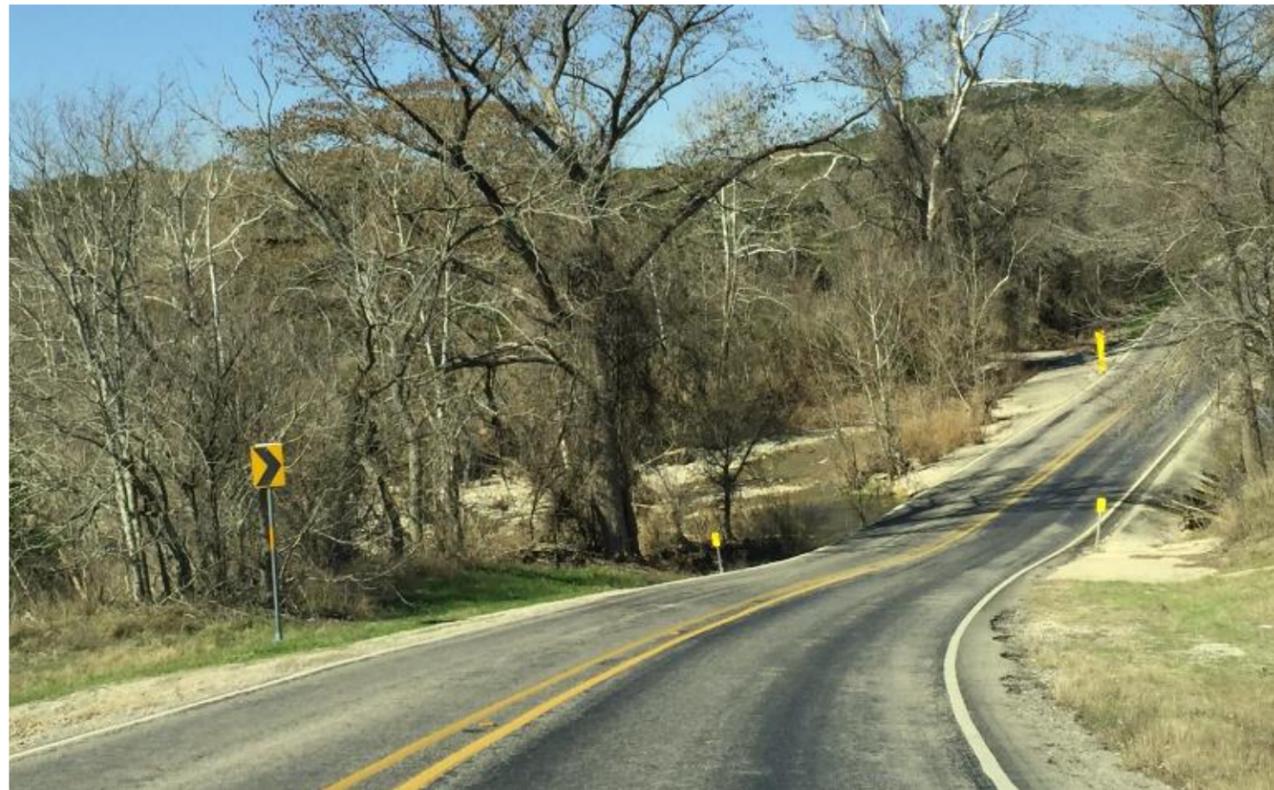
Existing Roadway (traveling westbound on FM 150)
